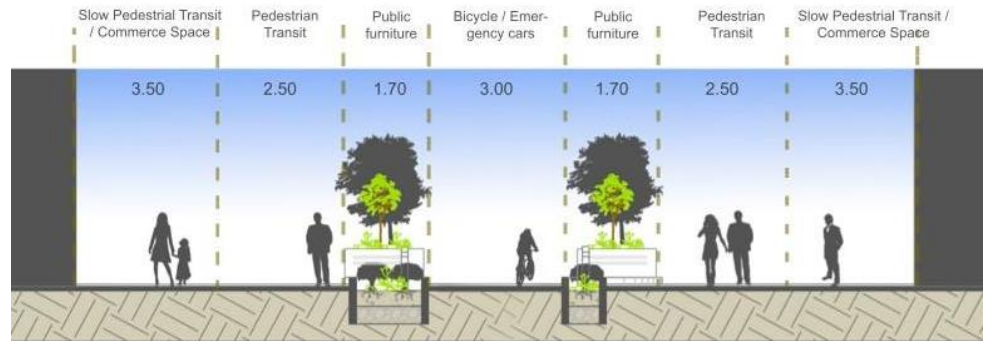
7 Dolores and Independencia streets intersection, details of the proposed changes in views and section
